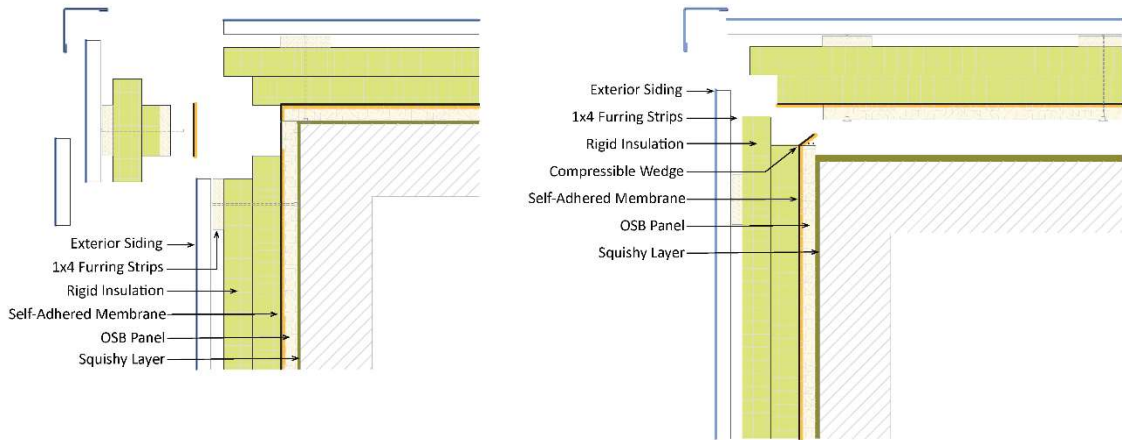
Open Corner Connection and Blind Corner Connection (Plan View)
